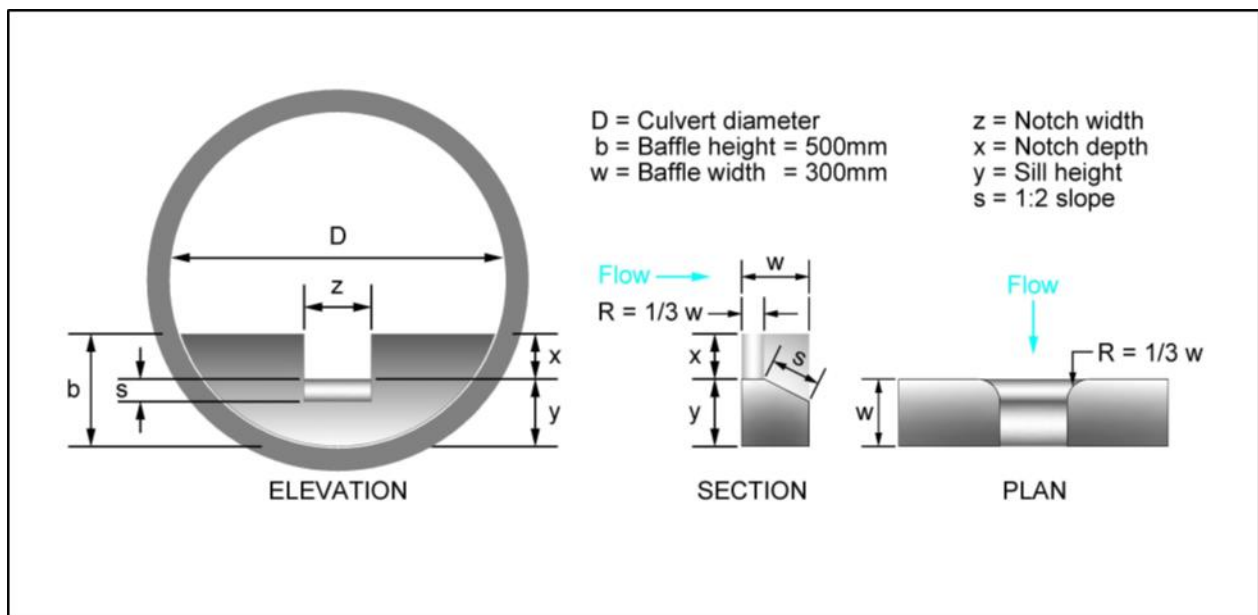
Baffle notch sizing for concrete culvert baffle (cross-sectional area).
